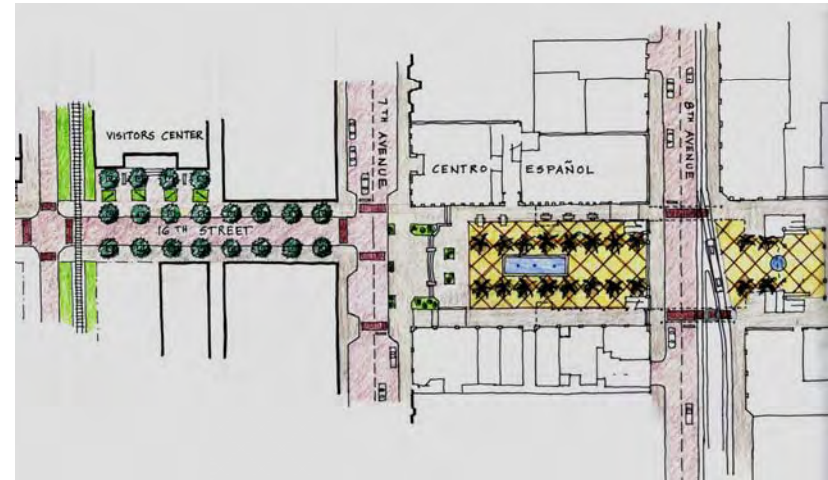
Plan View of the proposed Plaza at Centro Ybor.
